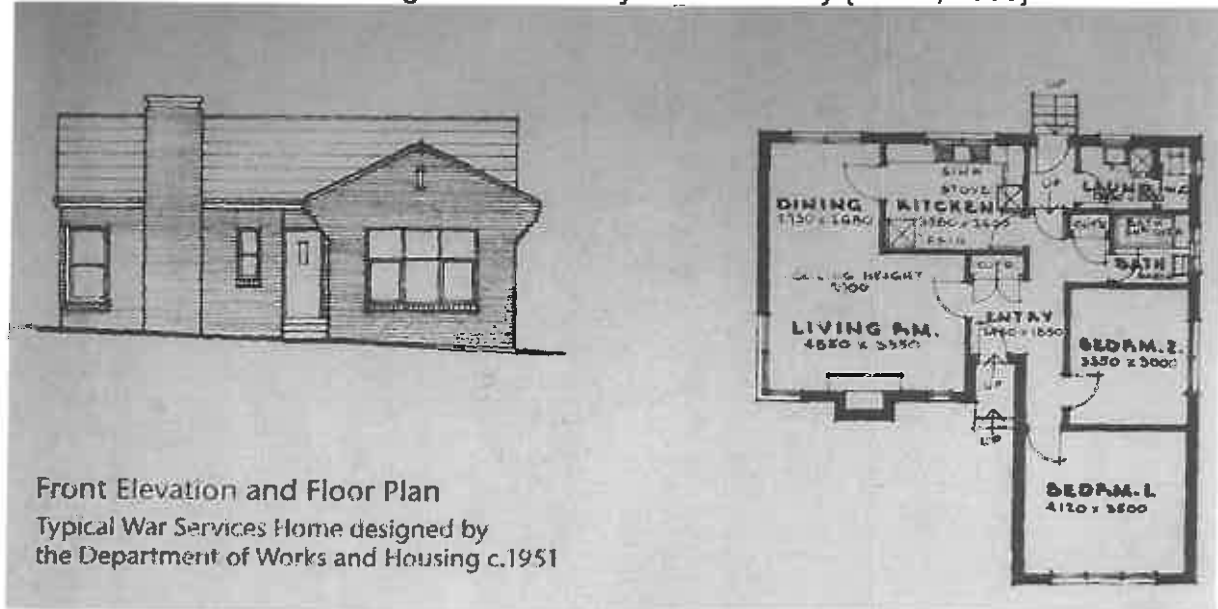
Typical elevation and plan (City of Whitehorse Heritage Trail Panel)
